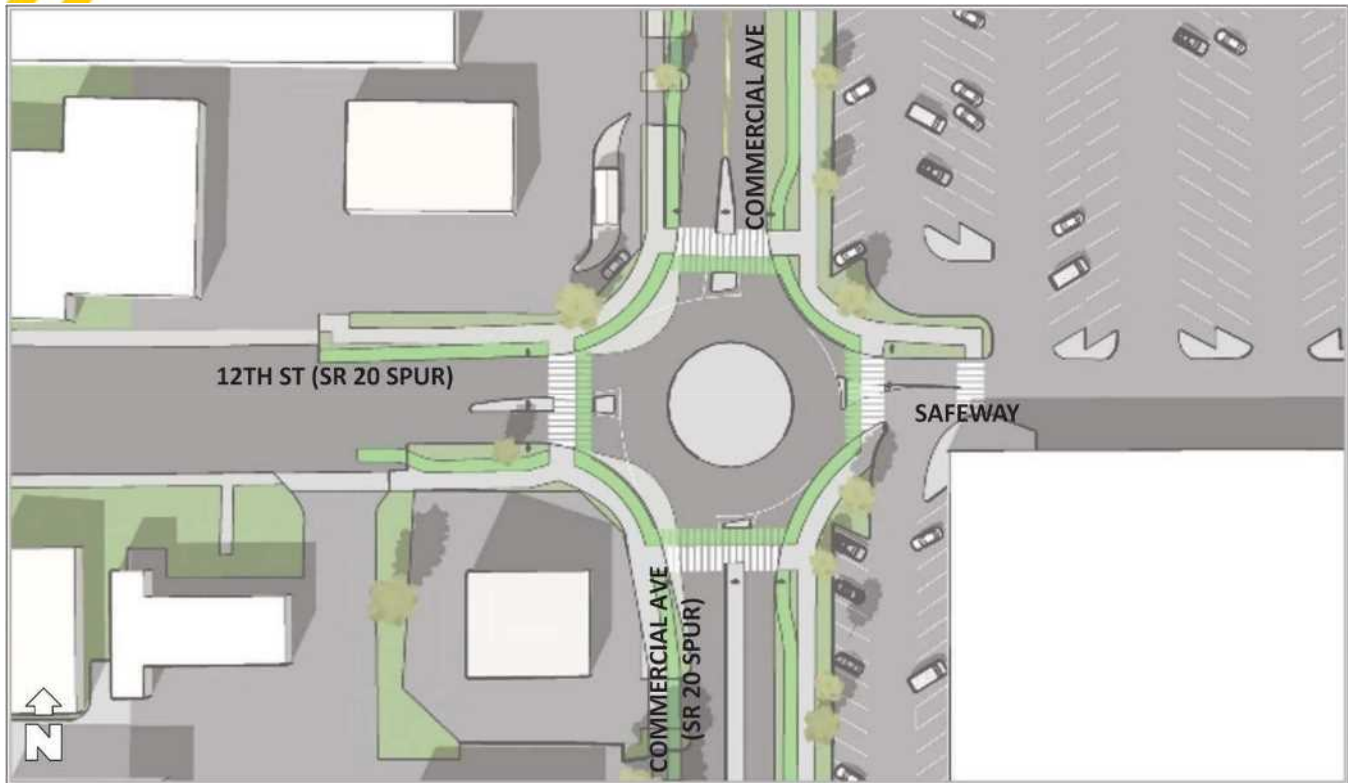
Commercial Avenue and 12th Street Single-Lane Roundabout Improvement
